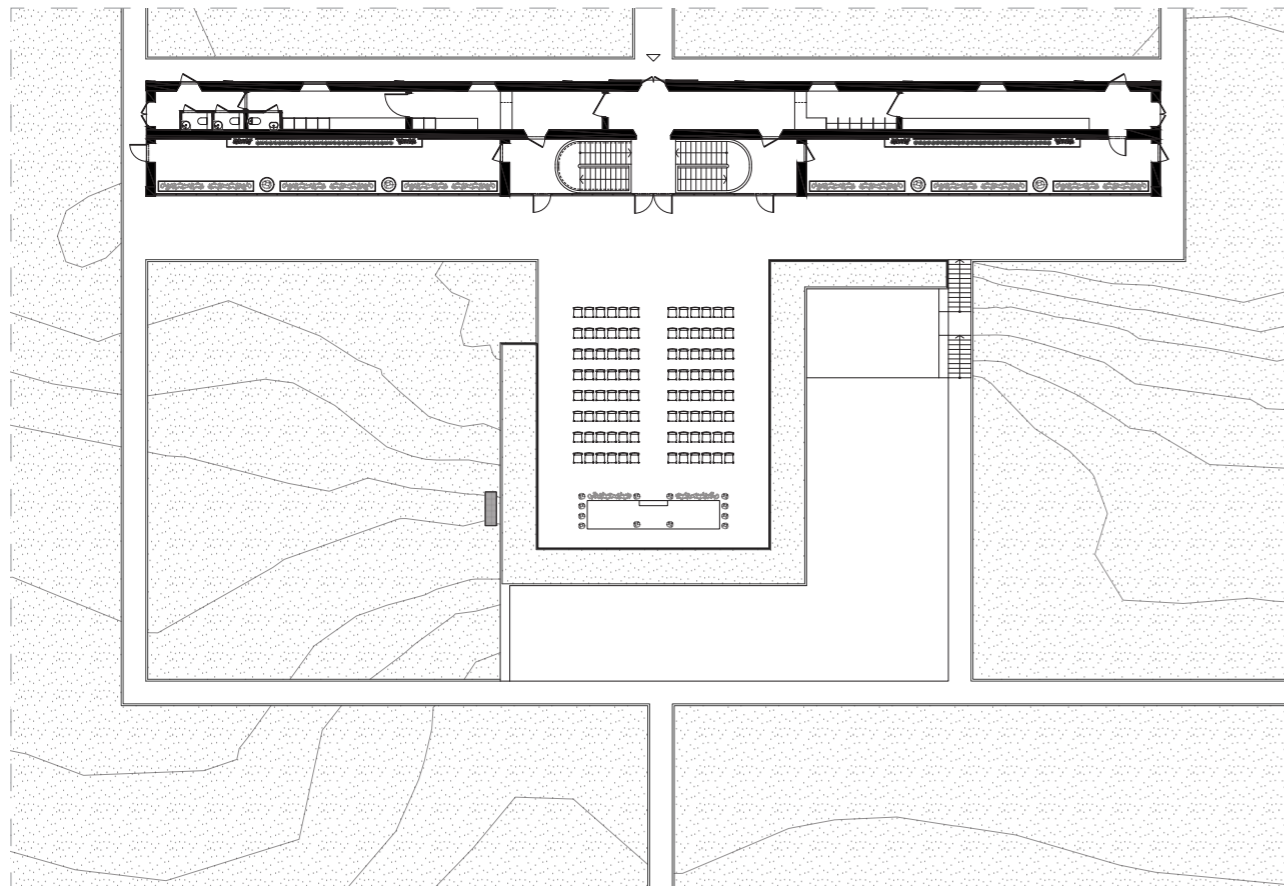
Wedding scenario, Entrance floor plan. Scale 1:400.
